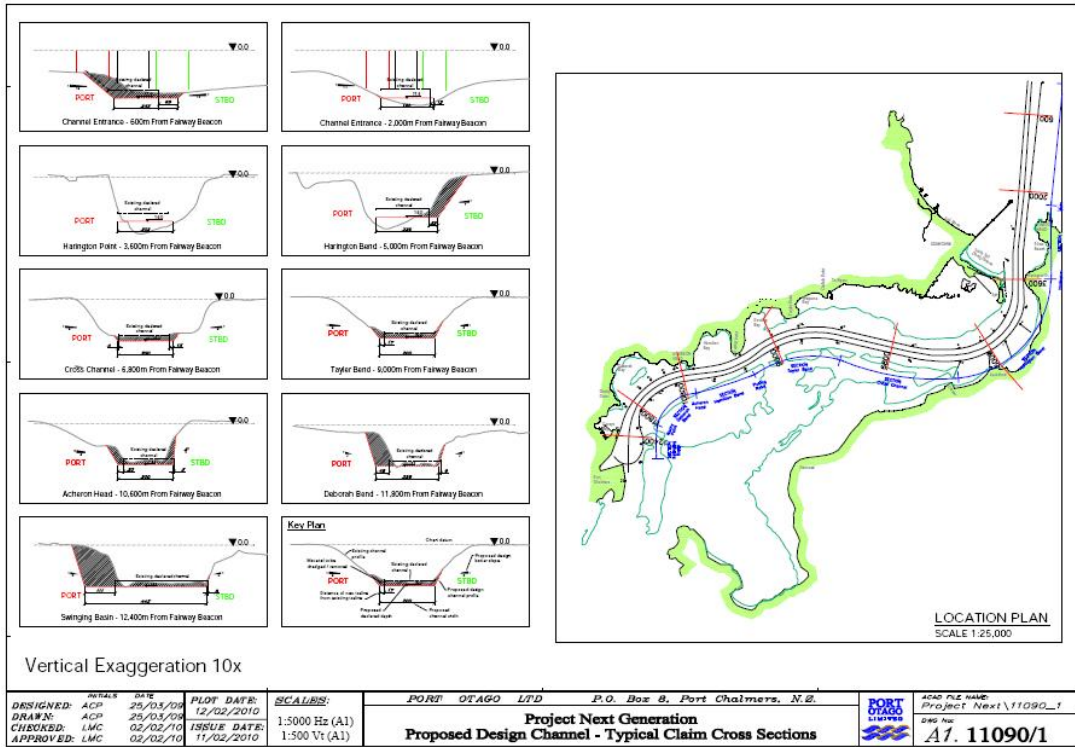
Proposed Design Channel – Typical Claim Cross Sections
